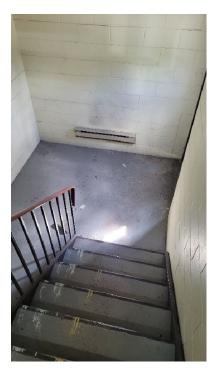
View of the interior of the common space on the second floor of the Site building.
